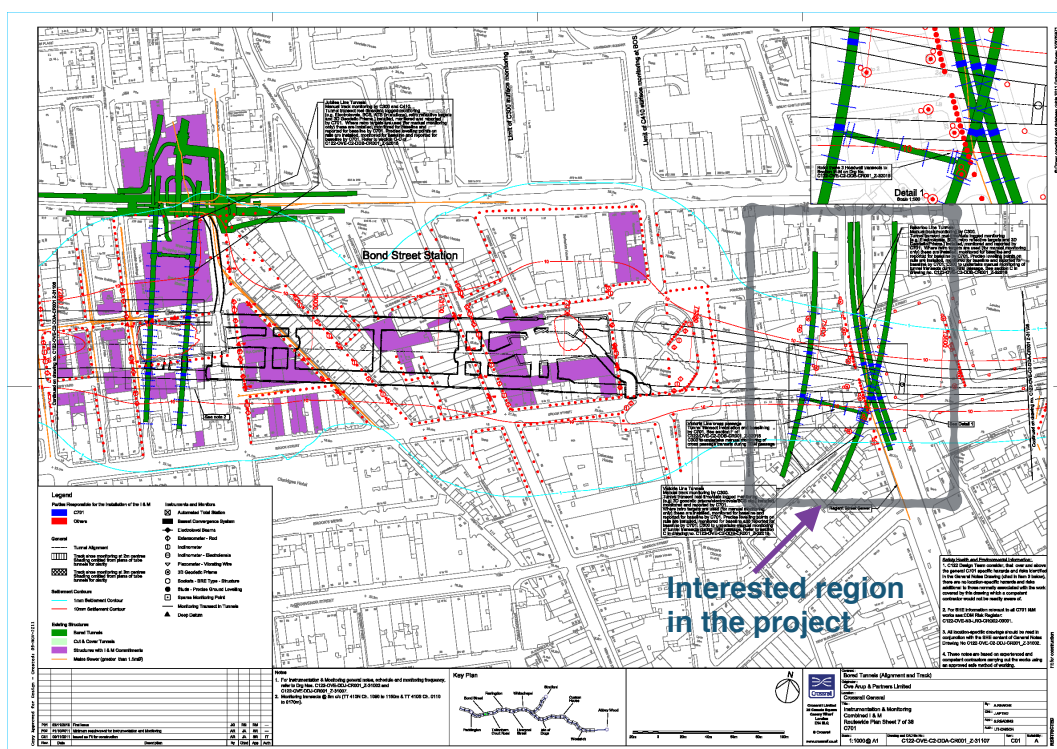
(a) Plan of the Central London Section for the position of the CRL tunnels and existing structures
